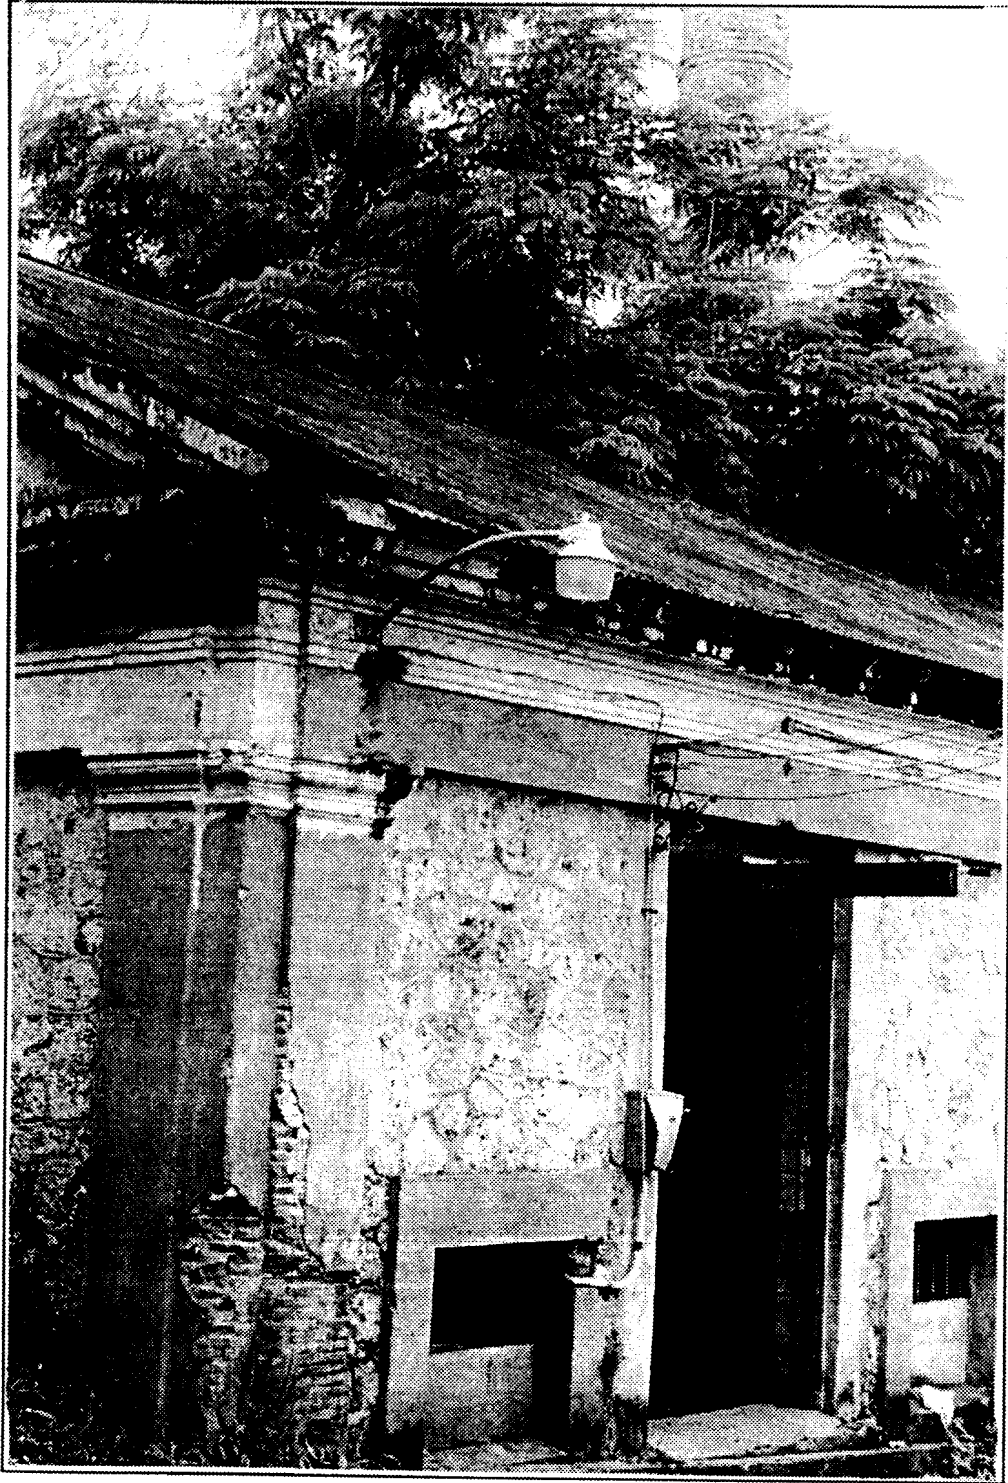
Northwest corner of PRASA machine shop. View towards the southeast.
